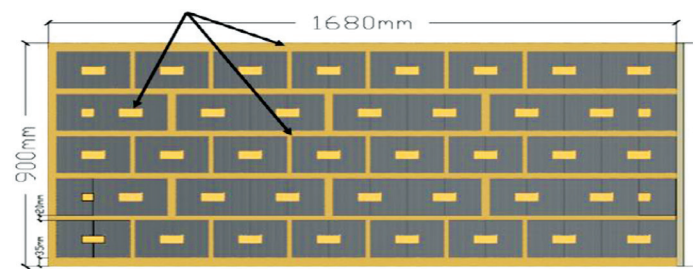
Plan View of Modular Brick in RSS Catchment Area
